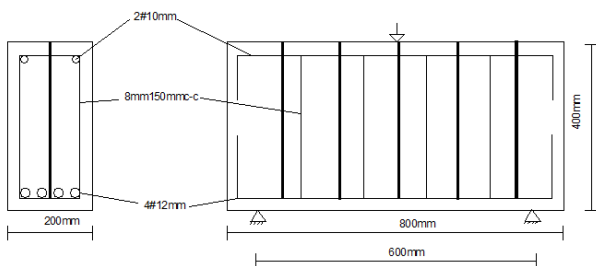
Schematic diagram :Cross-section and Longitudinal section of beams EB7-8-5
